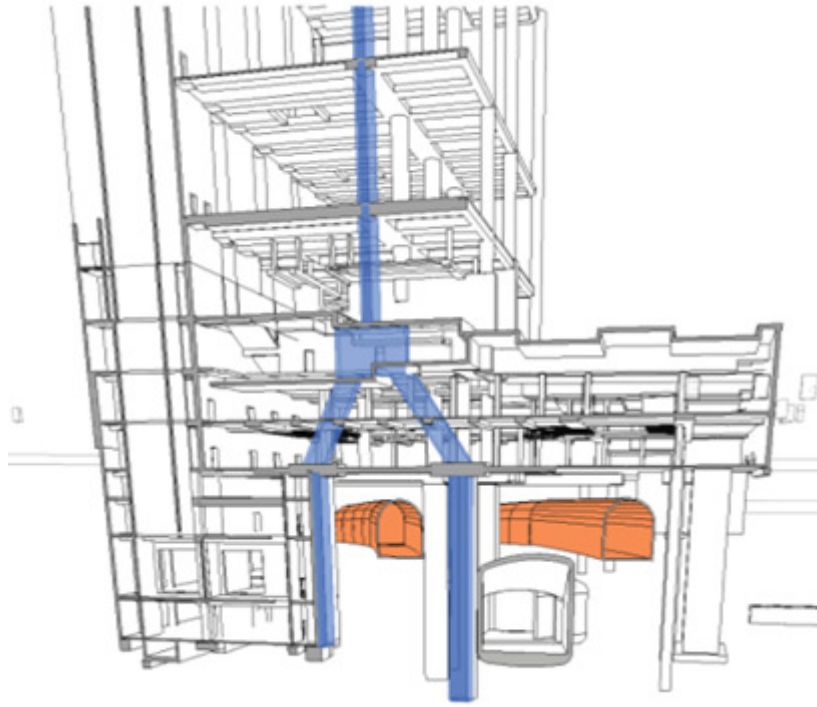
Section through the structure showing South Tower column bifurcating through the station to straddle the Eastern Suburbs Line (ESL) tunnel
